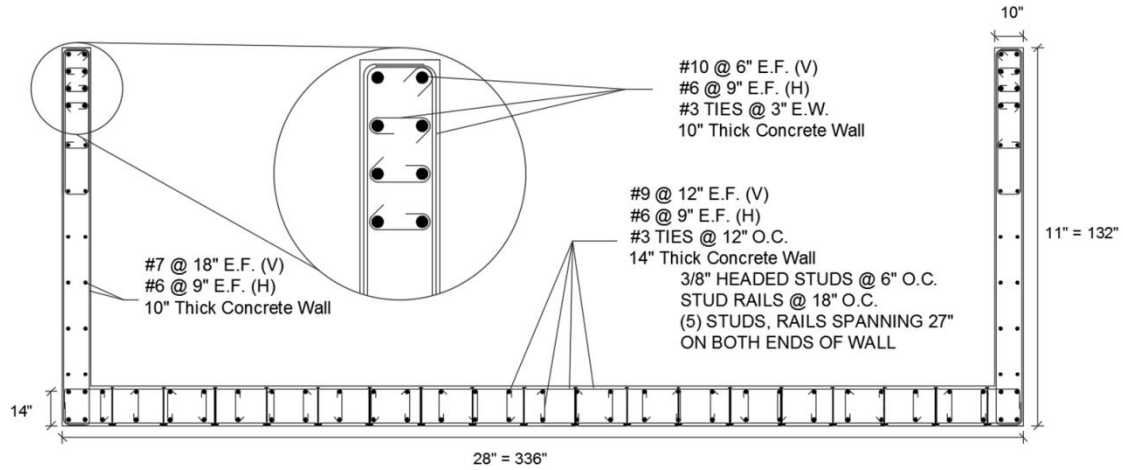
New overall 2nd floor Elevator/ Mech. Room shear wall
